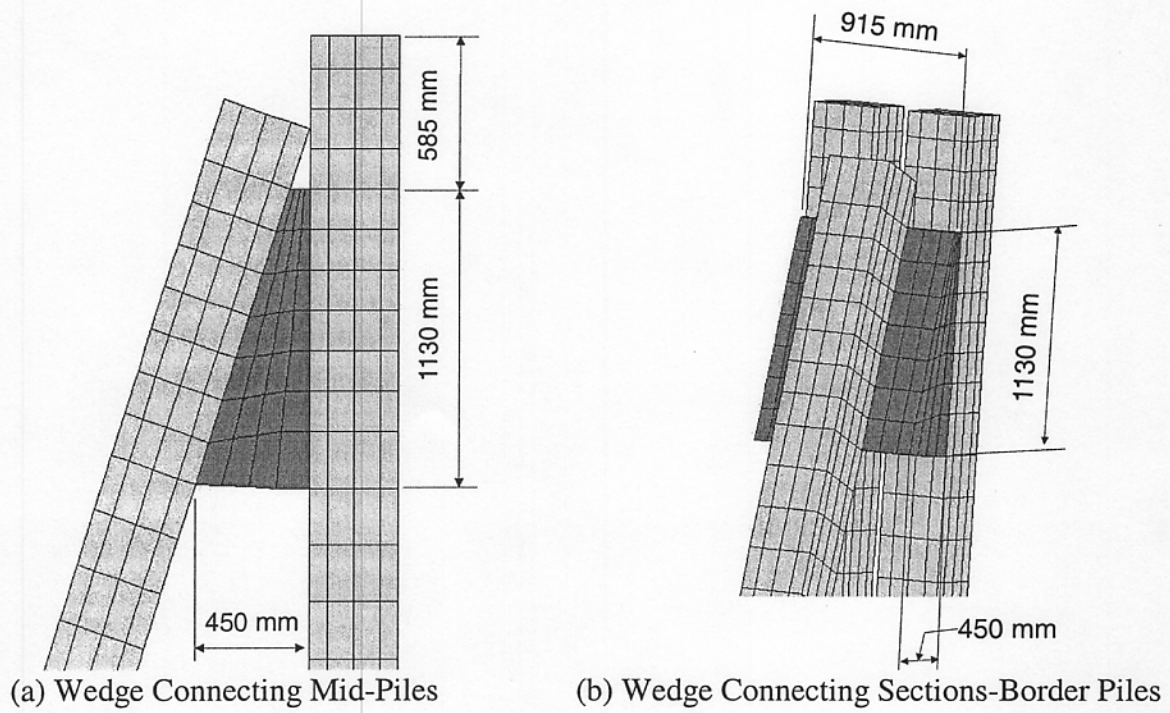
Detailed View of Concrete Wedge Retrofit
